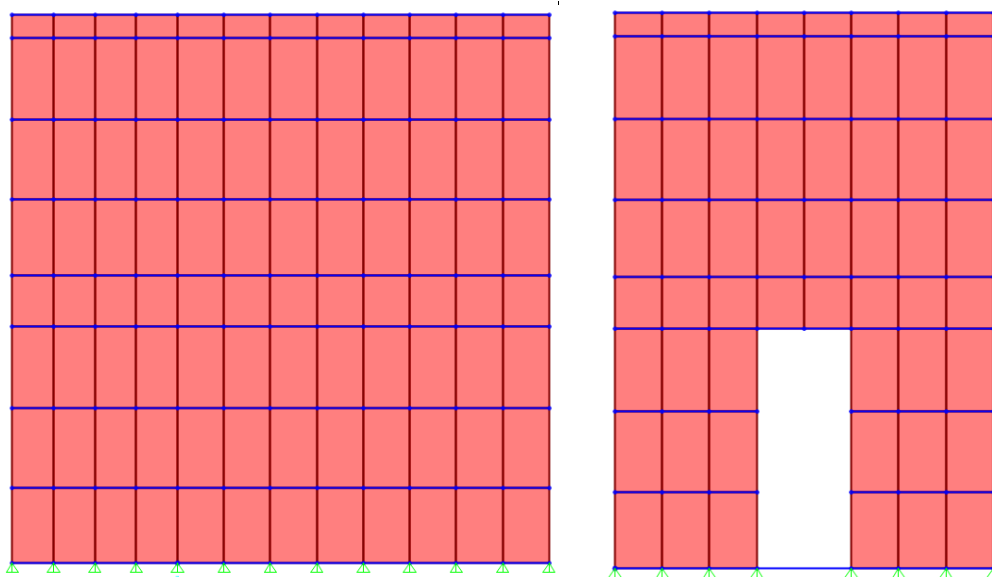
House WPL model elevation view, along Y axis: Exterior wall (left), Interior wall (right)
